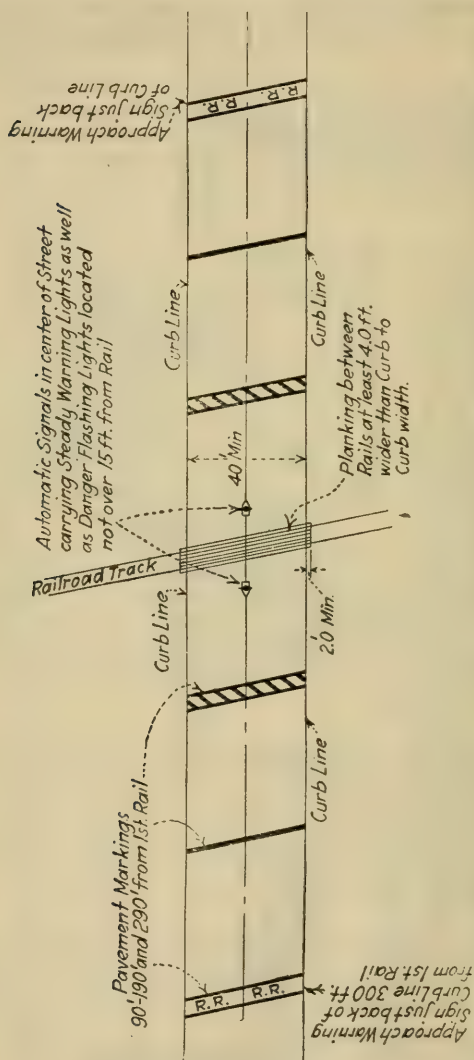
Typical village or city street grade crossing layout for signs and signals.
